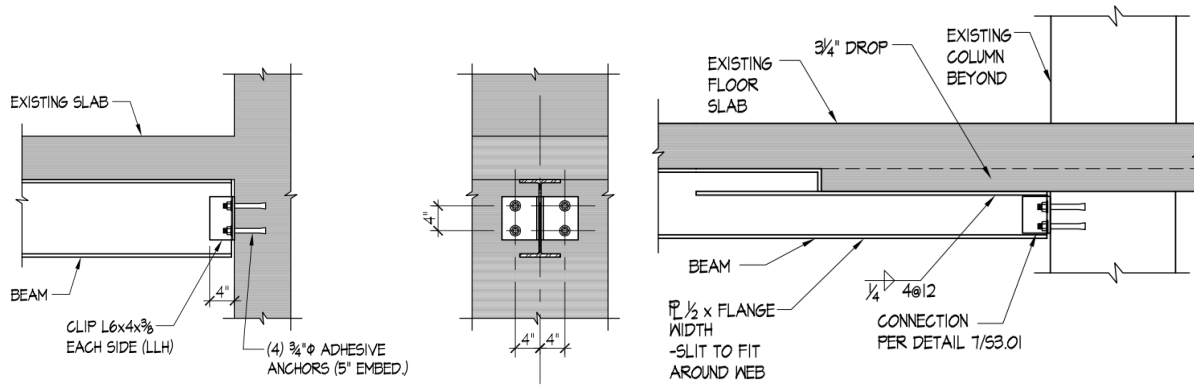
Steel Beam to Existing Concrete Beam of Column Typical Detail (Left) and to Column at Drop Panel (Right), 7 & 15 on S/3.01
